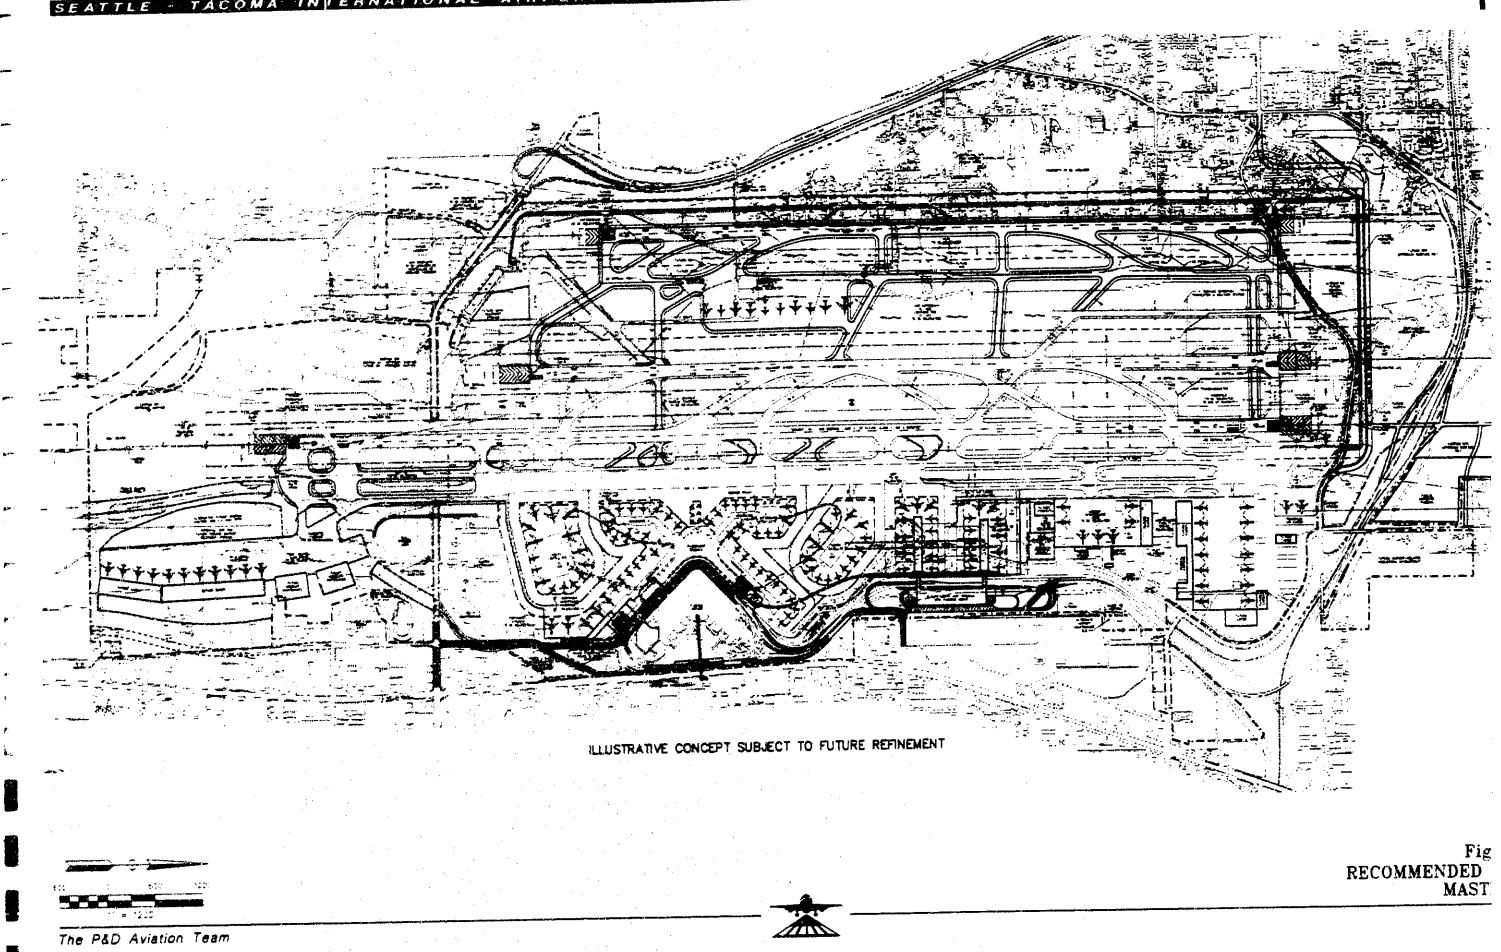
RECOMMENDED AIRPORT MASTER PLAN
